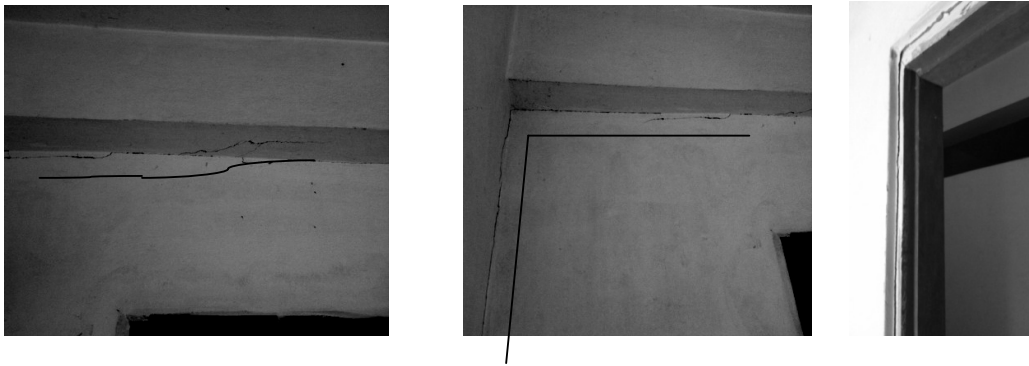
Cracked beam, wall joint and displaced door of the affected building
